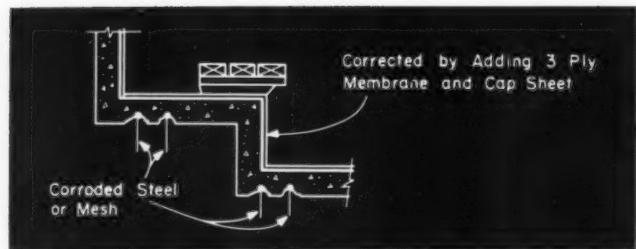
LEAKAGE CORRODES REINFORCING STEEL.
